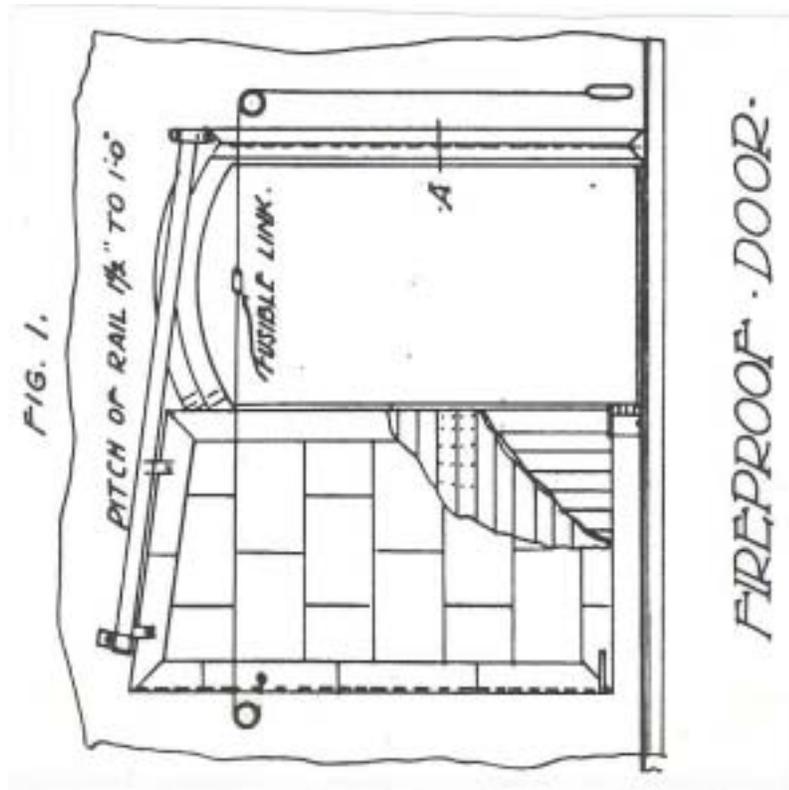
Design of fireproof door as included in original 1894 drawings. Pulley system was never installed [1894].
